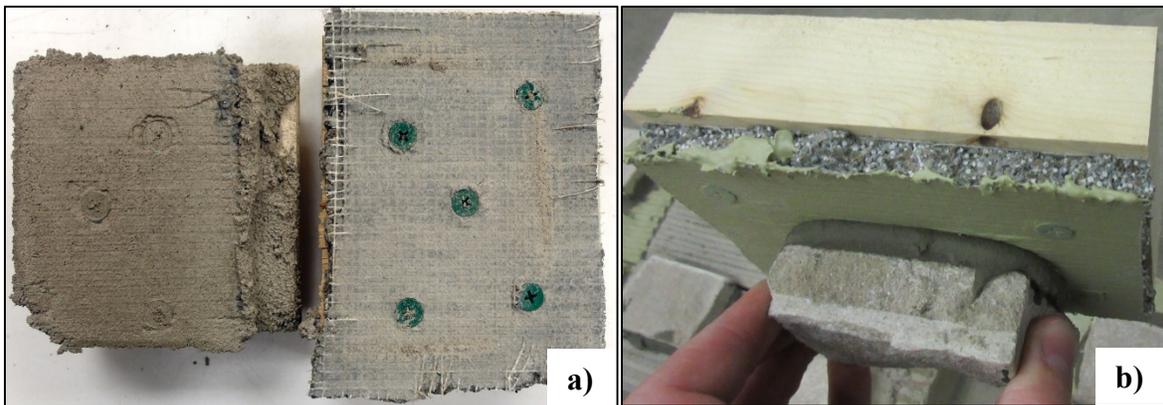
a) Cement Board Substrate b) Cement Board Substrate with Structural WRB.
